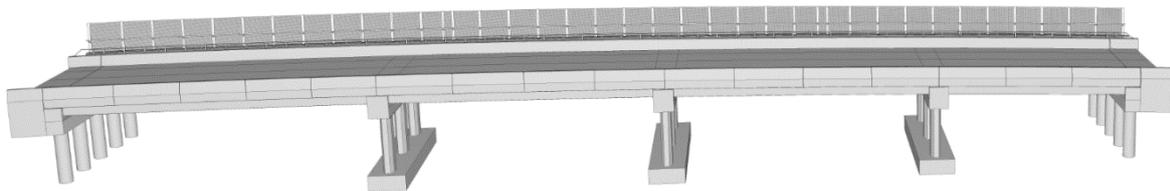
(b) – Typical structure model of bridge objects for a deck unit bridge
